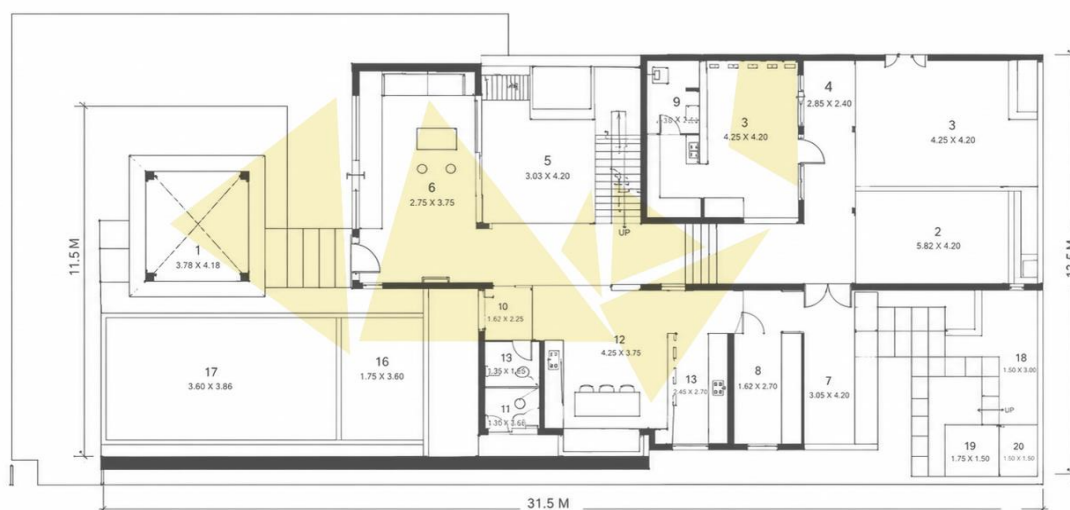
Chandroth Residence – Ground Floor Plan Showing the Isovist View
